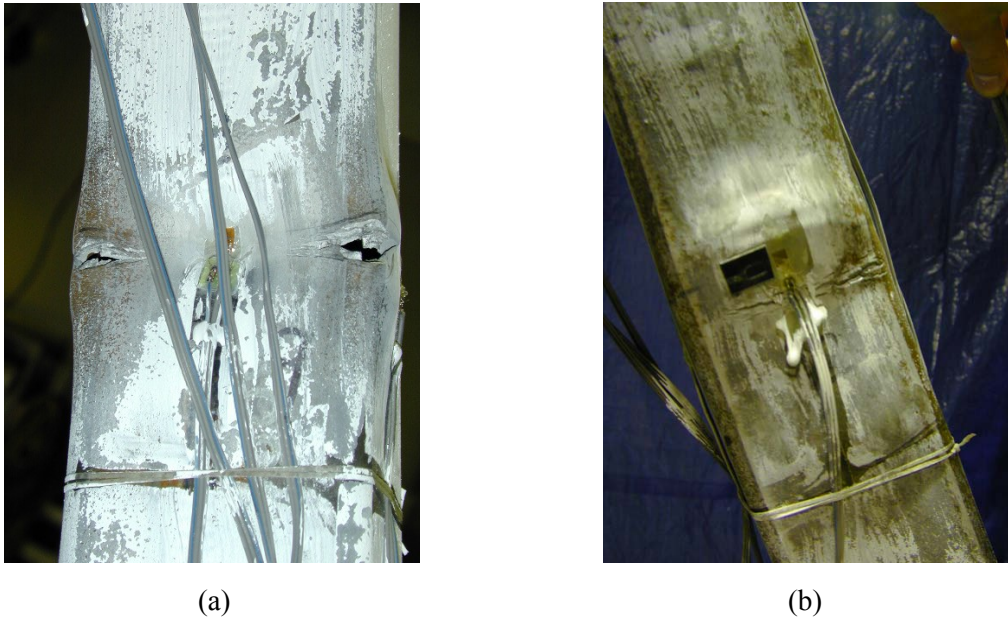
Crack formation for: a) Hollow tube brace; and b) Concrete-filled tube brace
